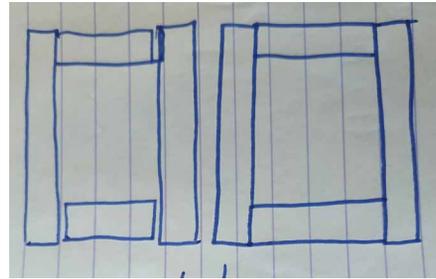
Sketch of timber frames as two smaller wall modules
